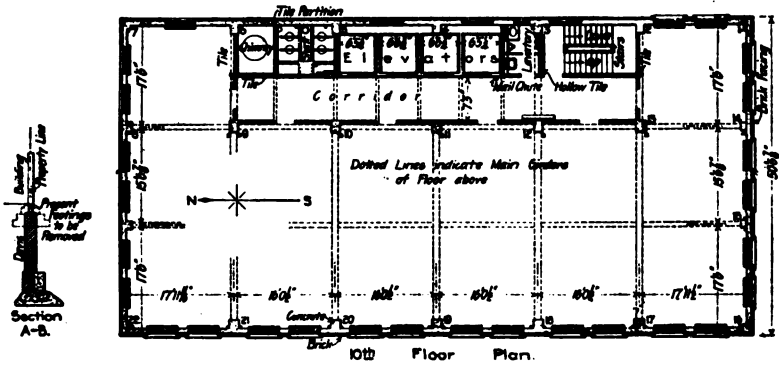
Plan of Tenth Floor of Ingalls Building.
